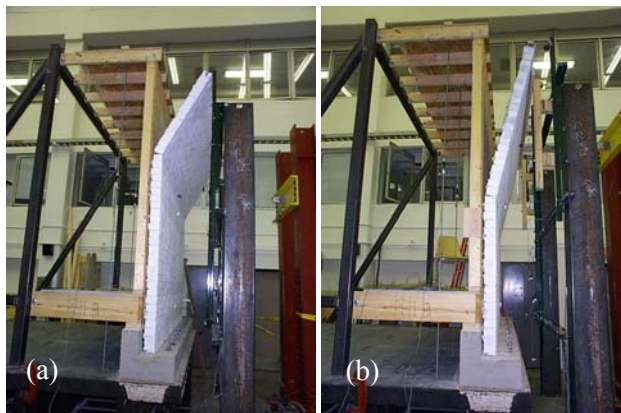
Collapse of the brick veneer in (a) Wall-1 and (b) Wall-2.
